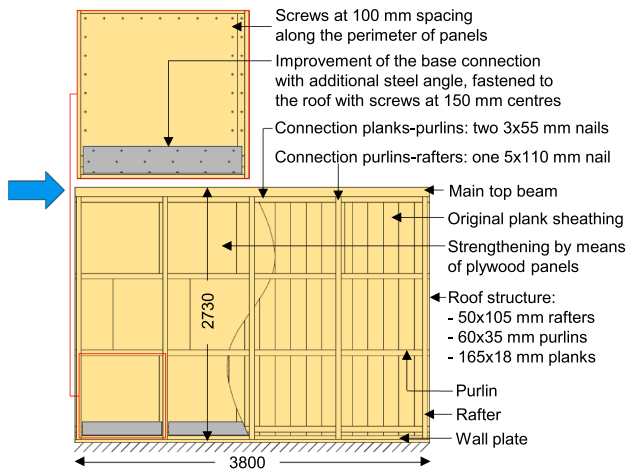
Schematic representation of the tested roof pitch (specimens DFpar-5 and 5s); view from the inner side. Dimensions in mm.
